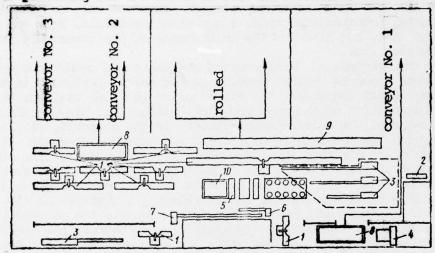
Diagram of the equipment network of the reinforcement shop.
